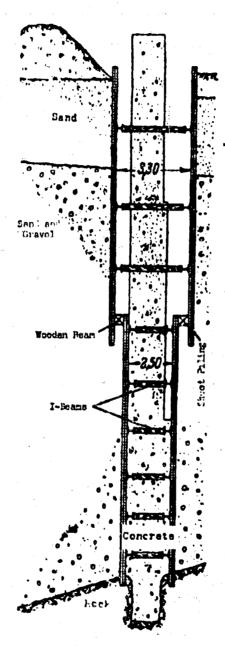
Foundation Column in Deep Pit with Sheet Piling
